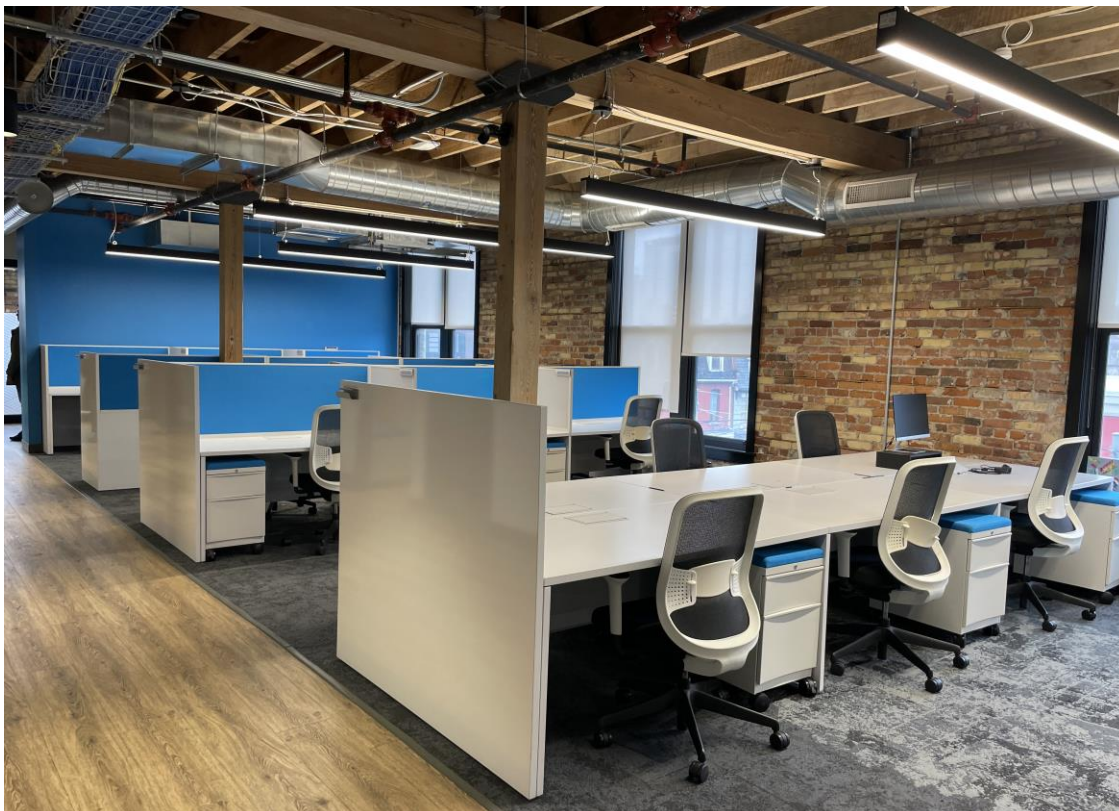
View of the third floor of 339 Queen Street East with beam timber frame construction (Heritage Planning, 2026).
